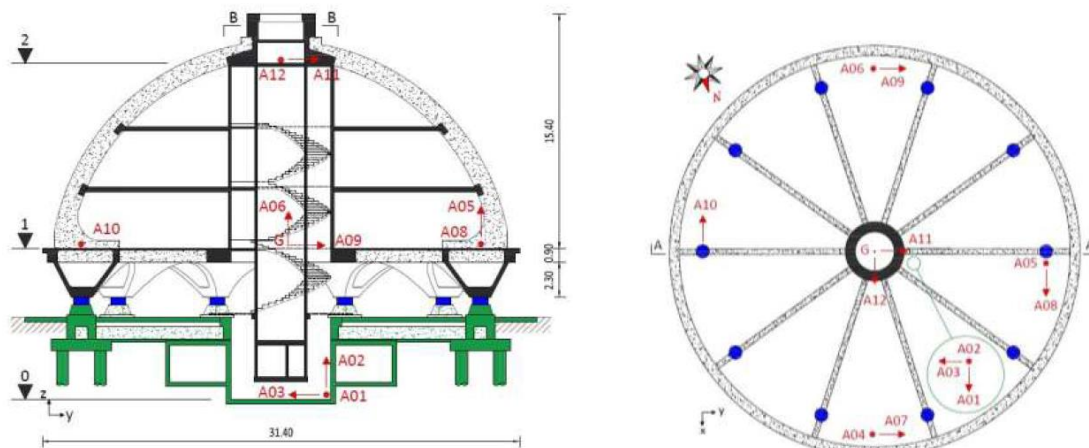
Accelerometers network: A01, A02 and A03 are at the basement inside the building; A04 to A10 are at the first floor above the isolation system; A11 and A12 are at the top of the building.
